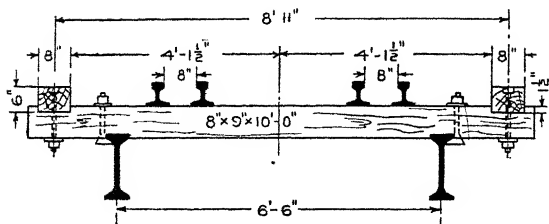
Sectional View Showing Open-Floor Construction of Railroad Bridge of Short Span, Single Track. I-Beams used for Stringers. Lehigh Valley Standard
